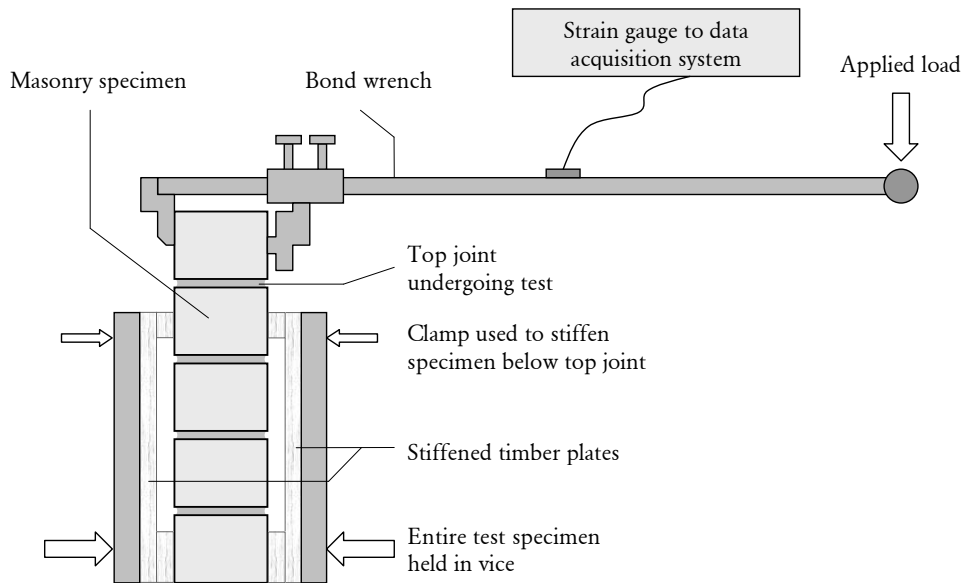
Bond wrench test arrangement, shown for the five-brick prism specimens constructed using full-sized brick units.
